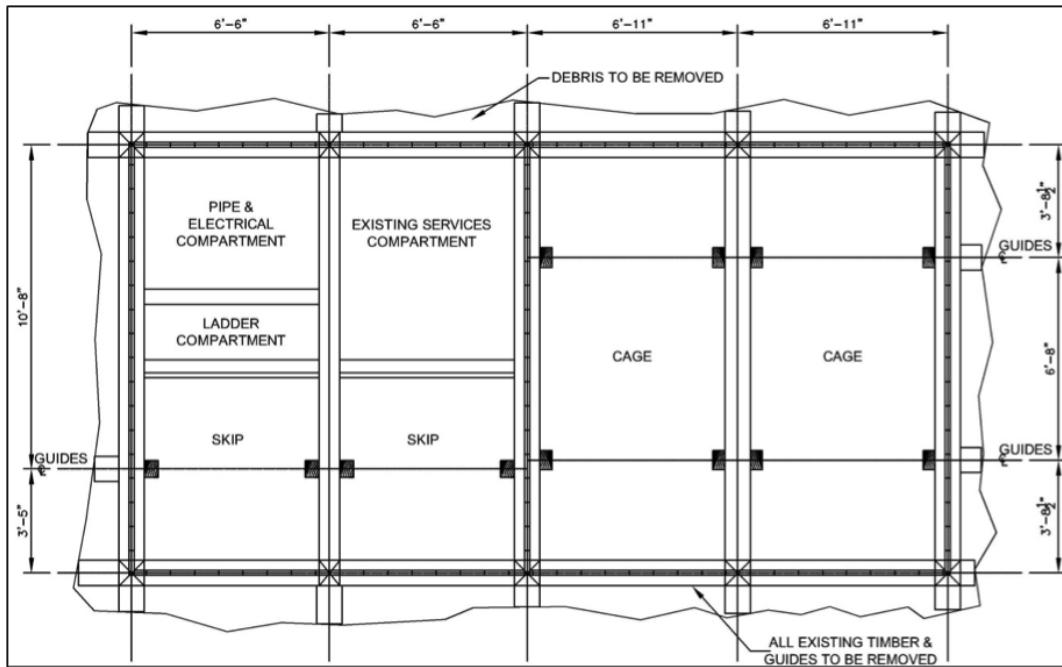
Existing Yates Shaft layout (Adapted from SRK, Courtesy SURF)
